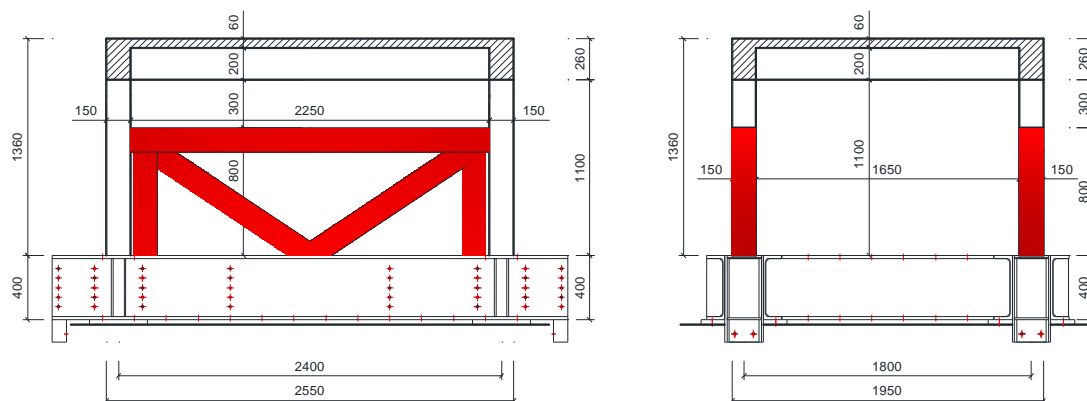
Geometry of the model (steel frame to simulate the infill wall is shown in red)
